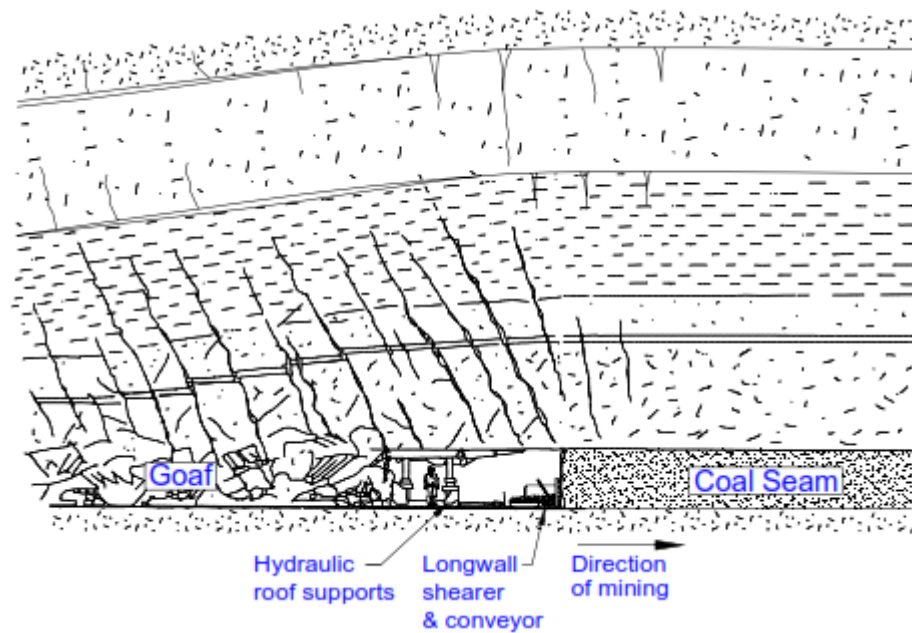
Cross-section of a typical longwall face (IESC, 2015).
